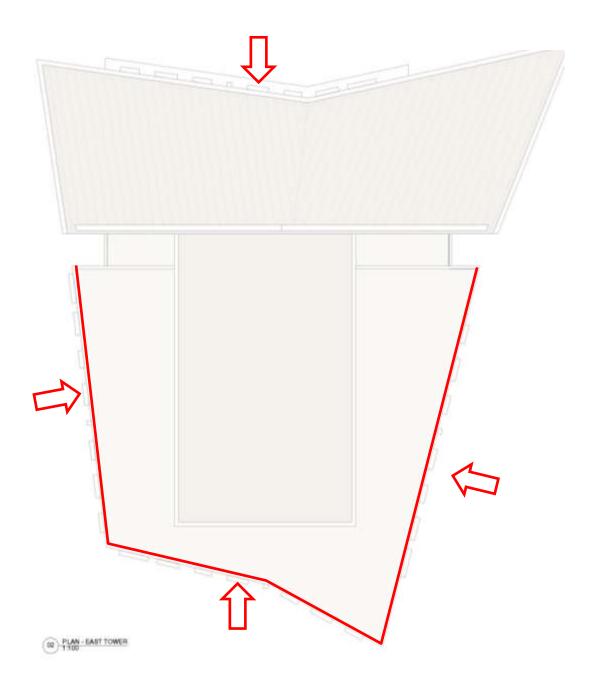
Roof plan showing location of building name signage and new parapet wall location (shown in red)
